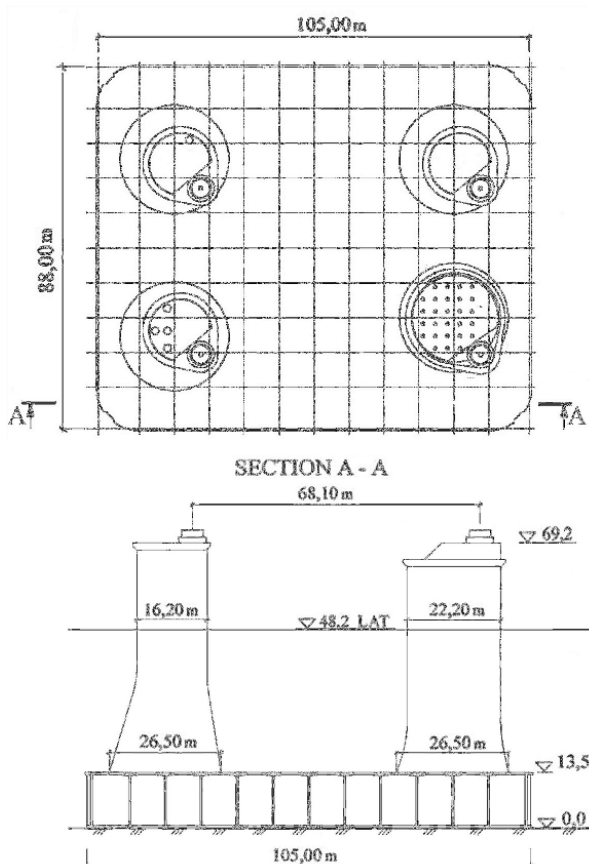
Plan and cross section of the substructure of the GBS Lun-A
